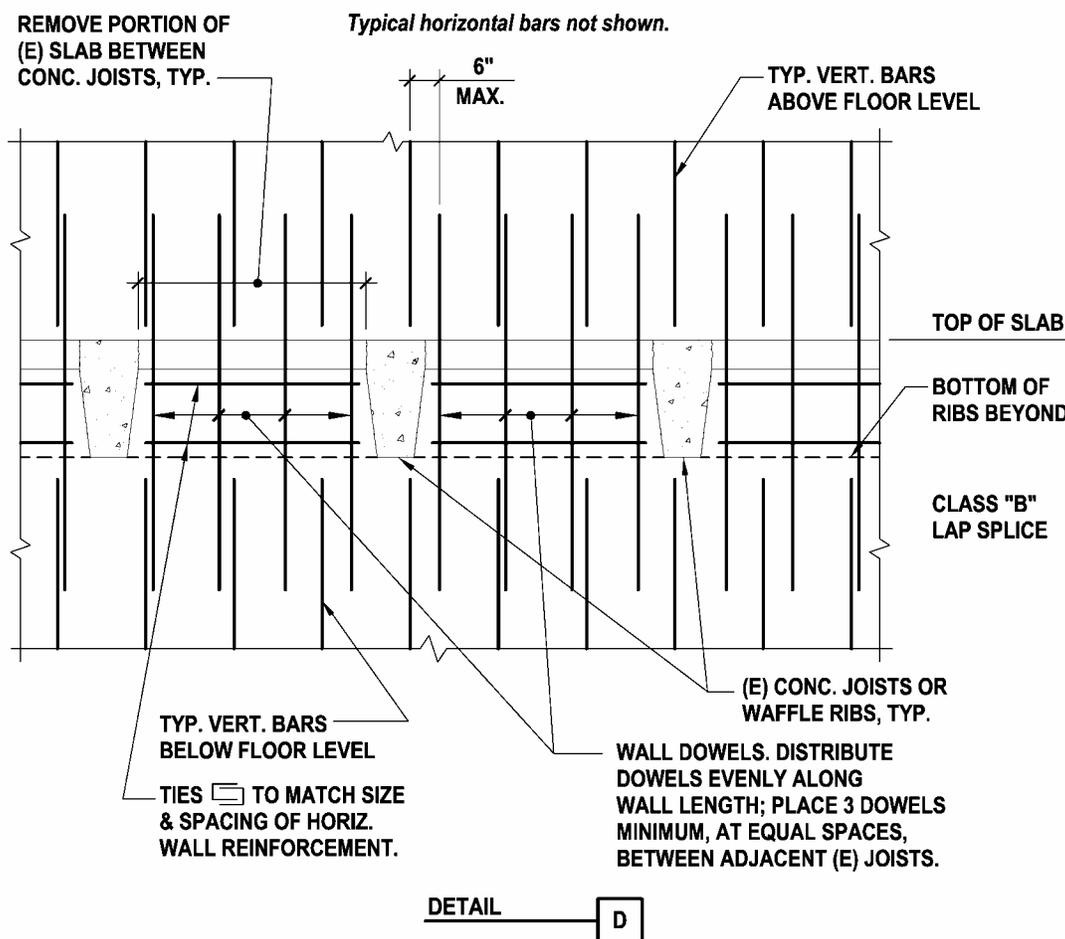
D: Concrete Wall Connection to Waffle Slab – Partial Elevation View
